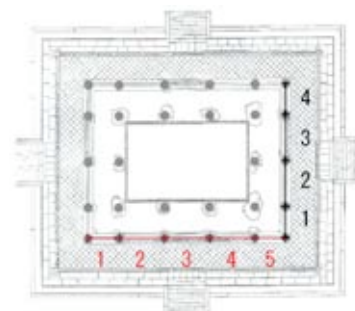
A “5ken, 4men”; Plan of the Main Hall of Hōryū-ji.
